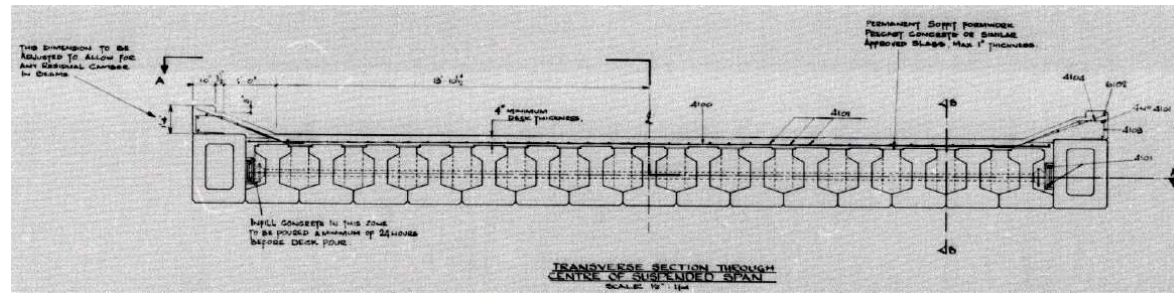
Cross-section of beams and slab at mid-span from historical drawing.
